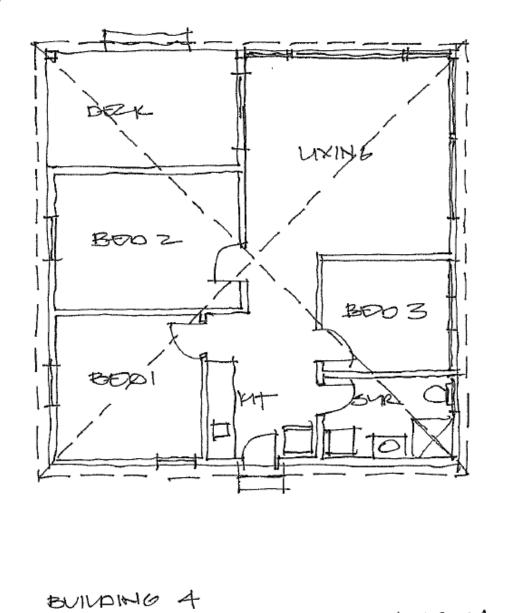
Sketch plan of Building CM2. (Source: David Hobbes of Philip Leeson Architects, May 2014)
